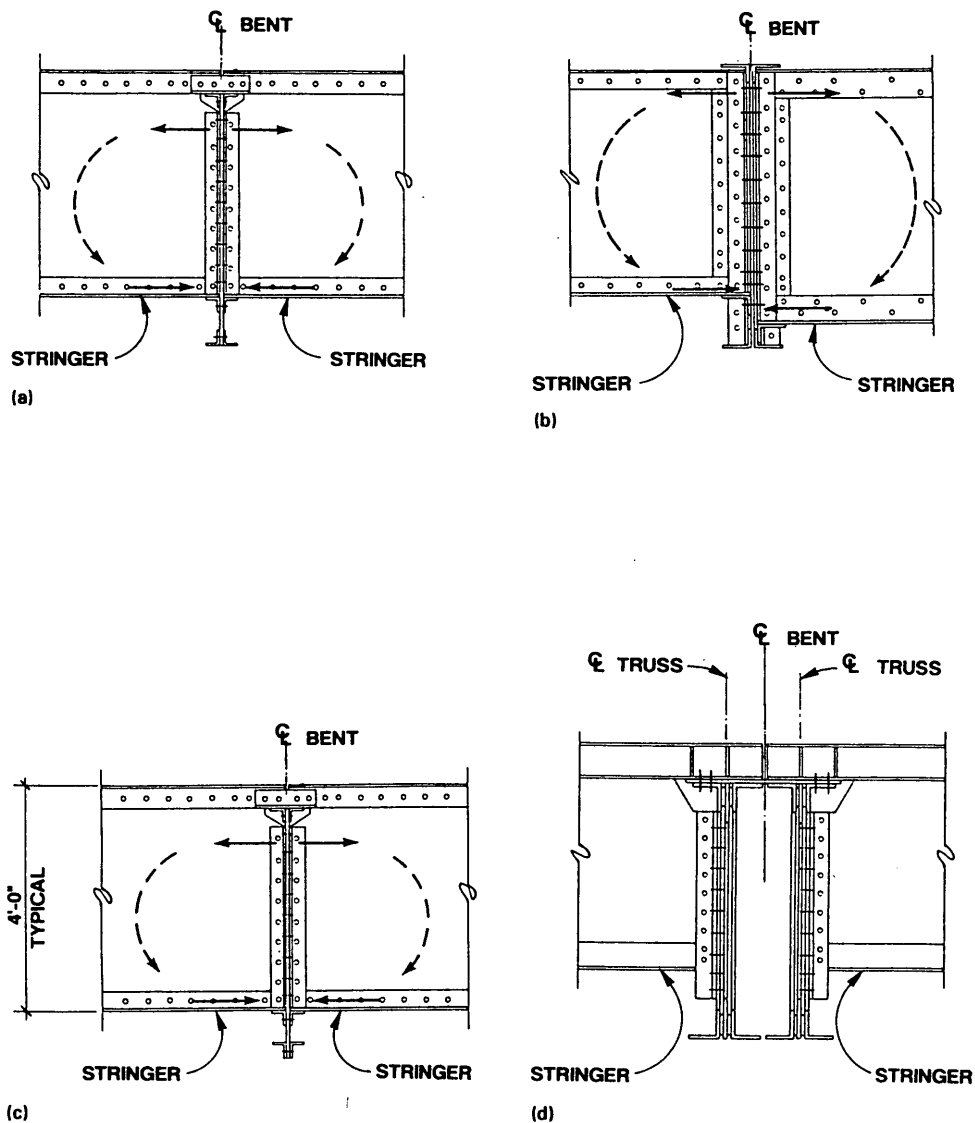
Typical details at fixed connections between stringers and support bent: *a*, South Mainline; *b*, South Loop Line; *c*, Englewood Line; *d*, Jackson Park Line.
